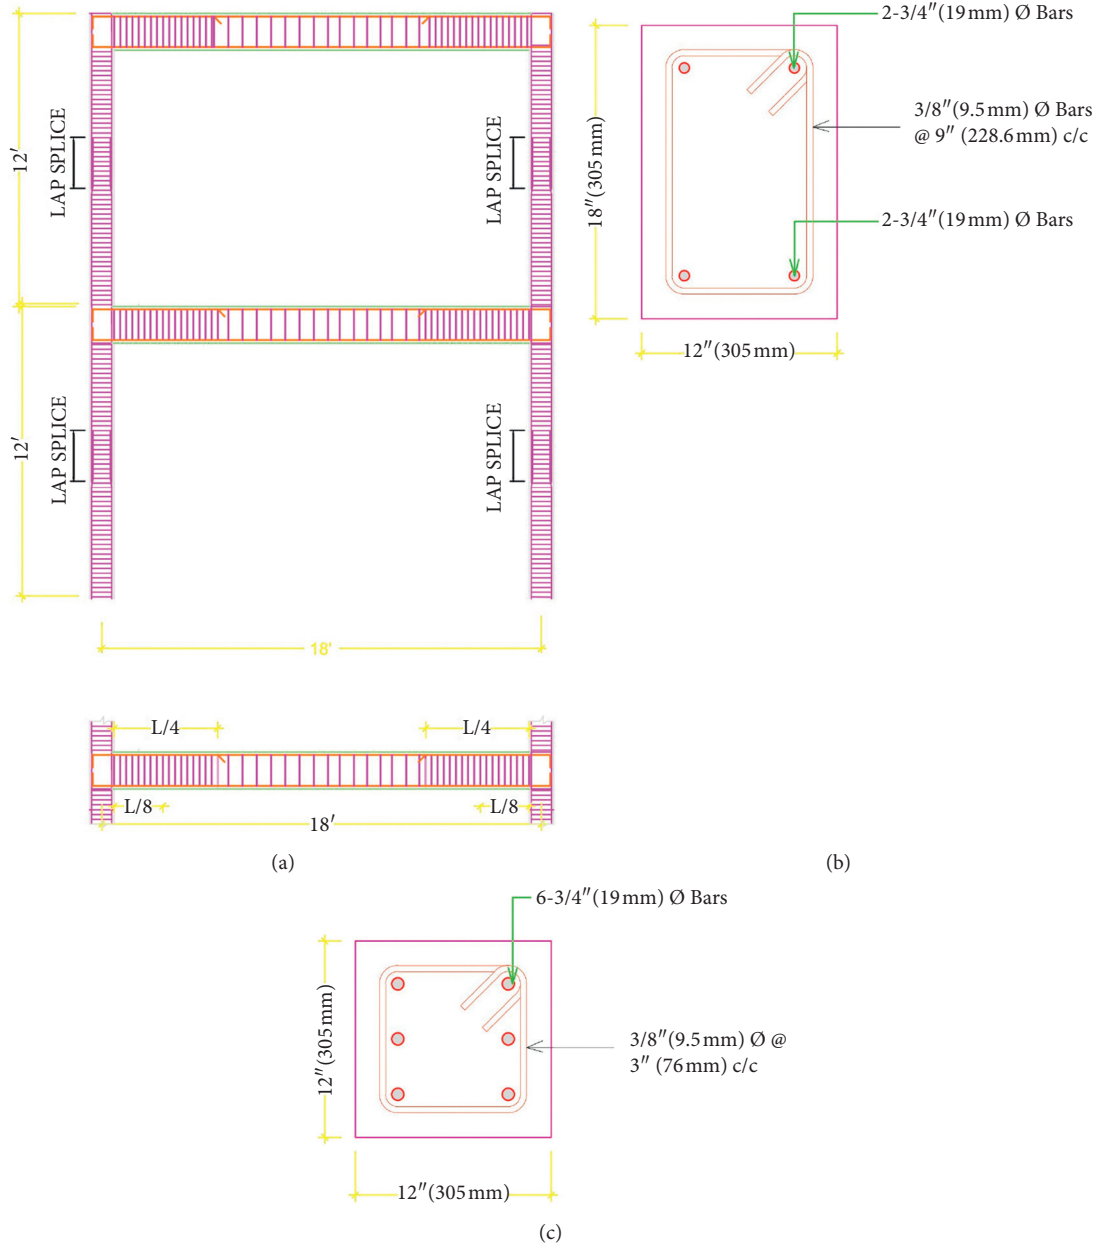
Geometric and reinforcement details of the considered RC SMRF structure. (a) Beam long section. (b) Beam cross section. (c) Column cross section.
